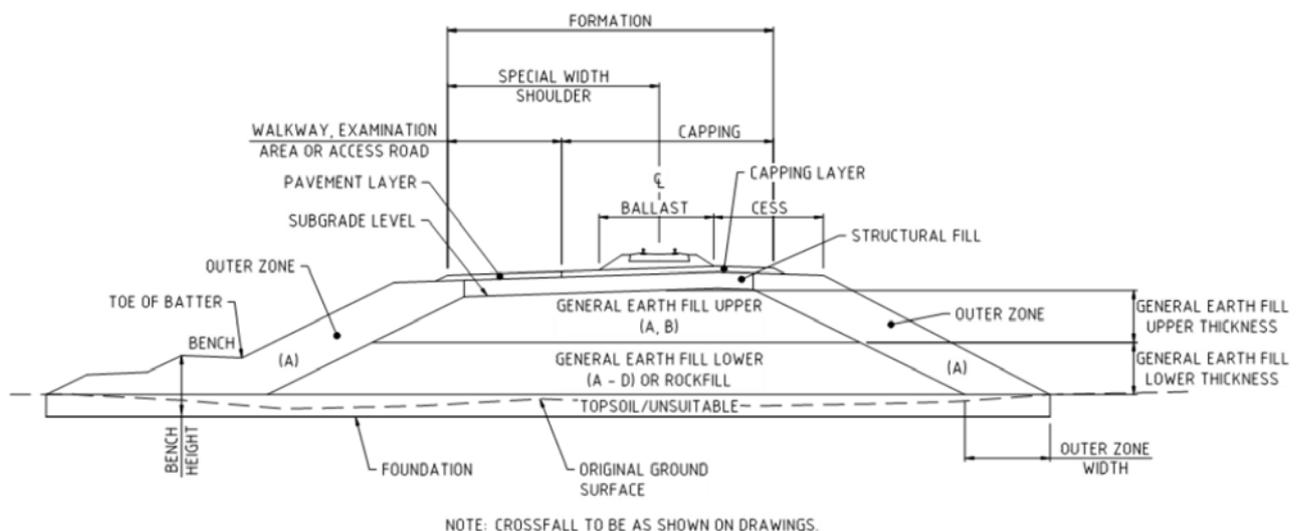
SCHEMATIC OF ZONED EMBANKMENT CROSS SECTION
